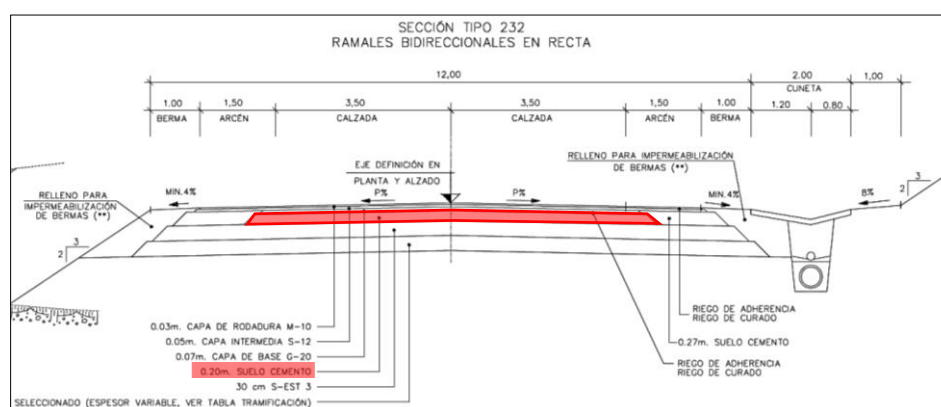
SOIL-CEMENT OF THE CROSS-SECTION
